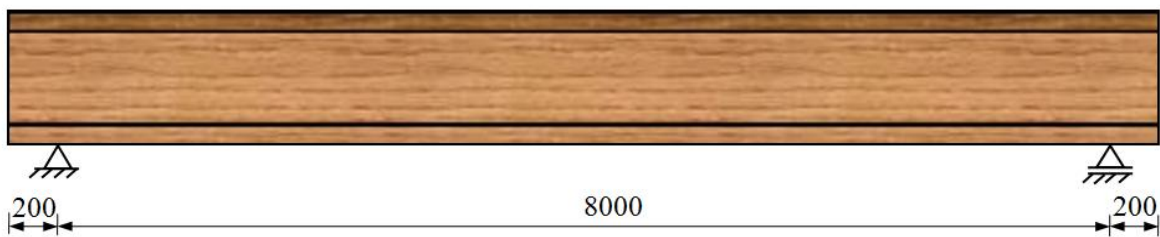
A schematic diagram of setup for 8 m span timber beam (mm).
